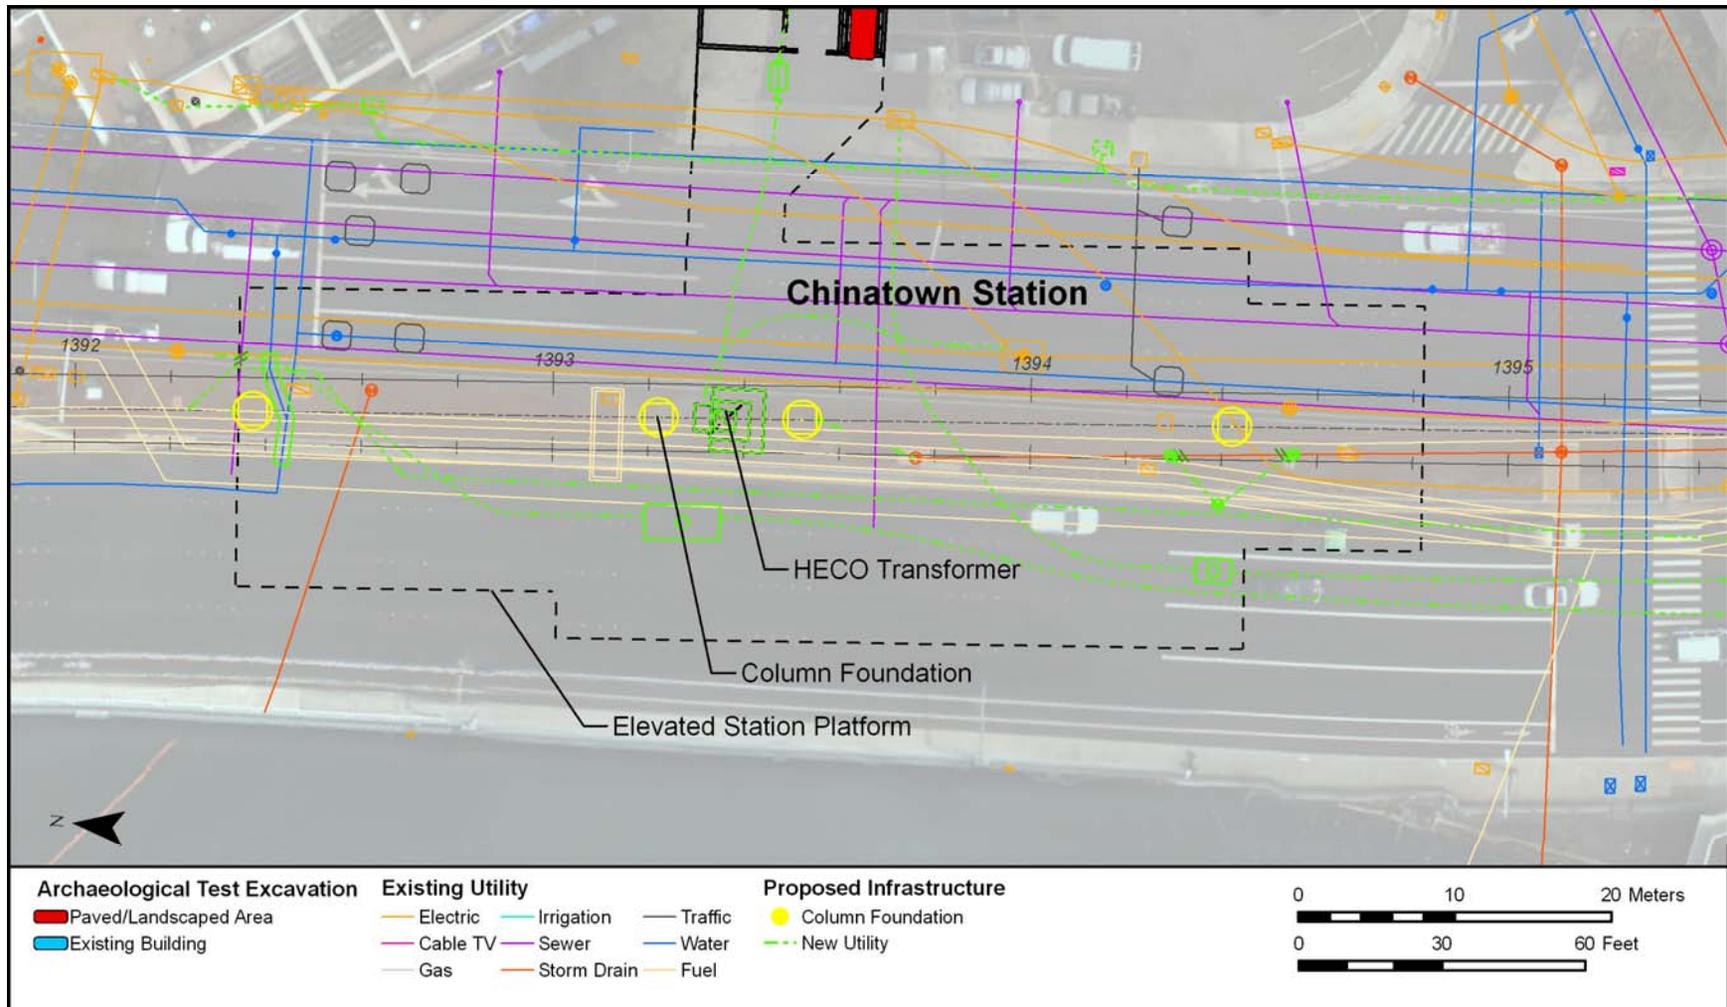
Chinatown Station detail of column foundation layout (no testing of four column foundations due to their location seaward of the former coastline and constraints)
